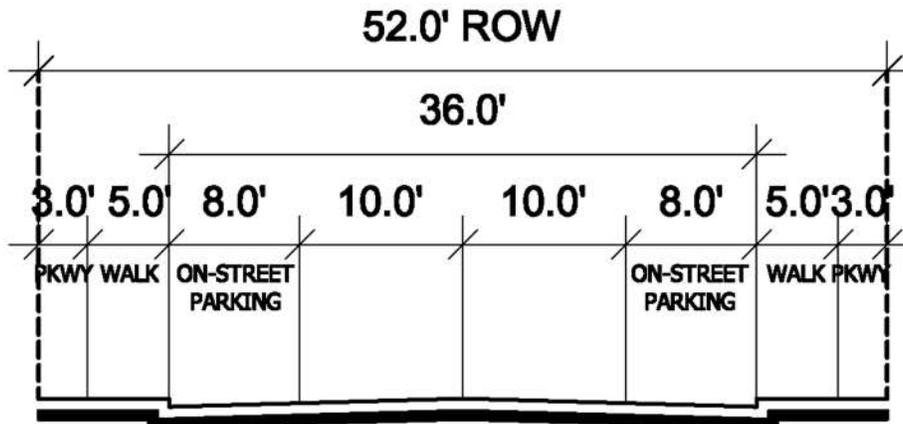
CENTRAL GREEN LOOP
